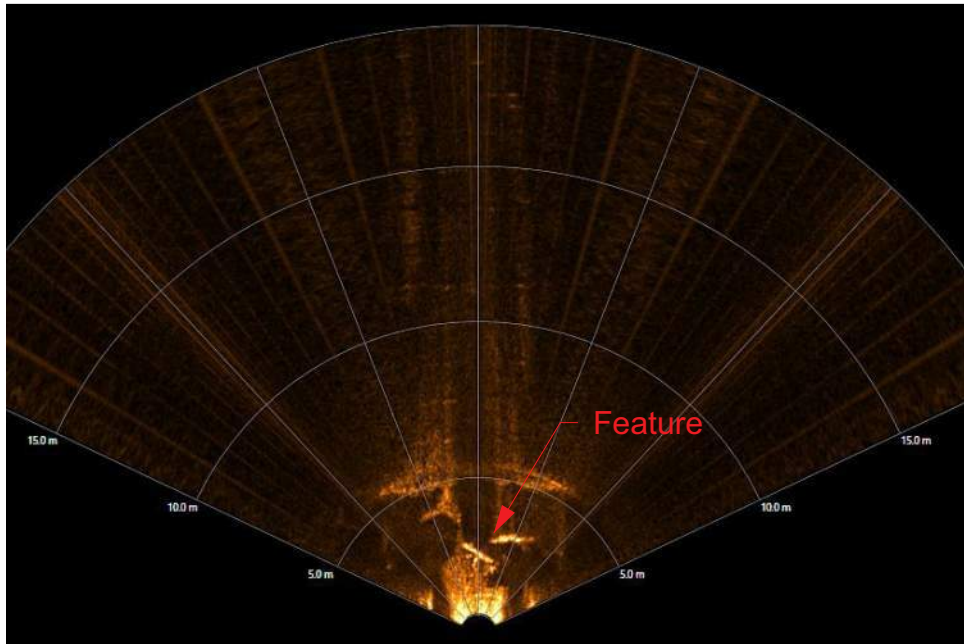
Sonar image at 148 feet downstream of Access Point 1. Feature in manhole chamber 10 feet ahead.
